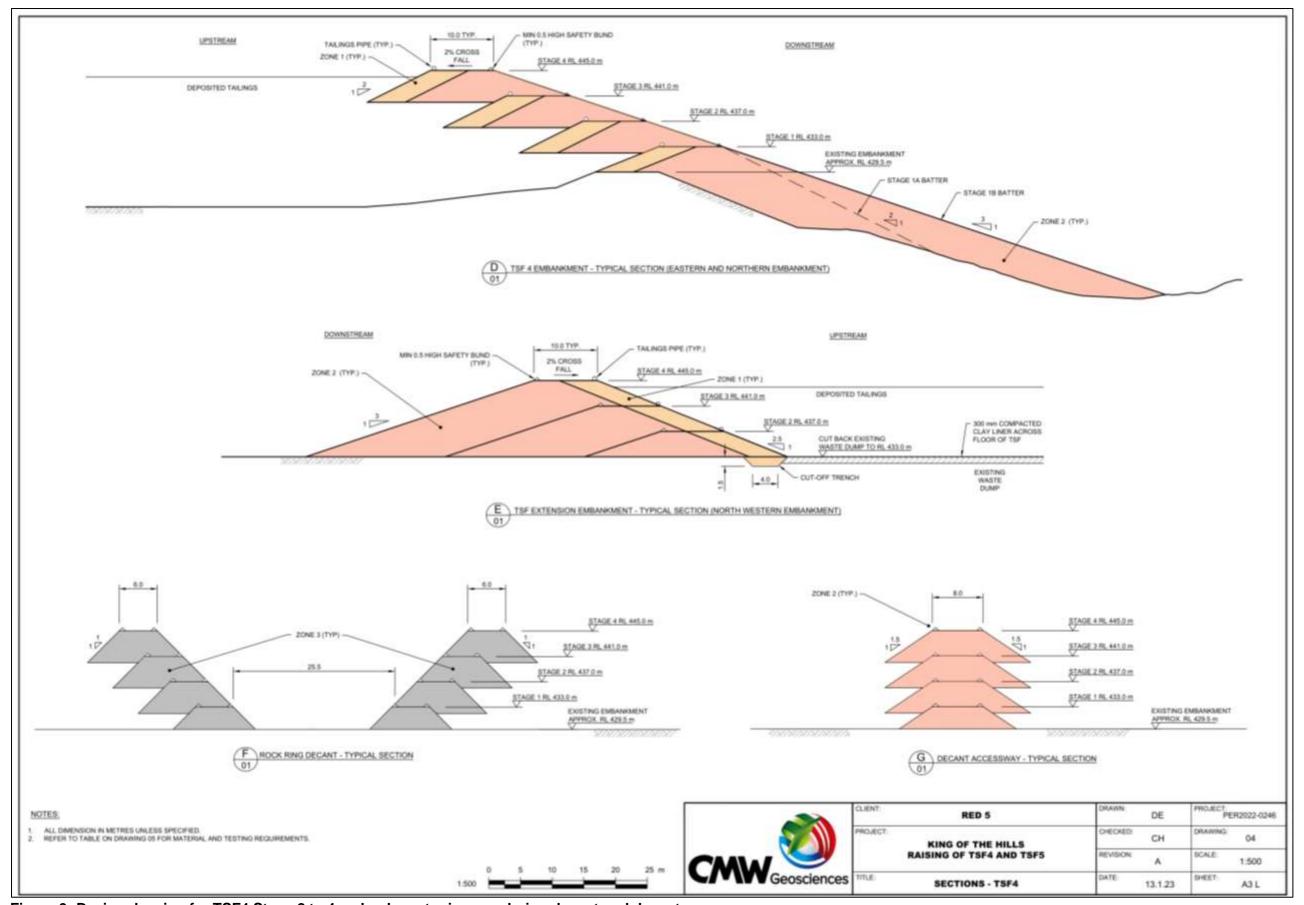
Design drawing for TSF4 Stage 2 to 4 embankment raises, rock ring decant and decant accessway
